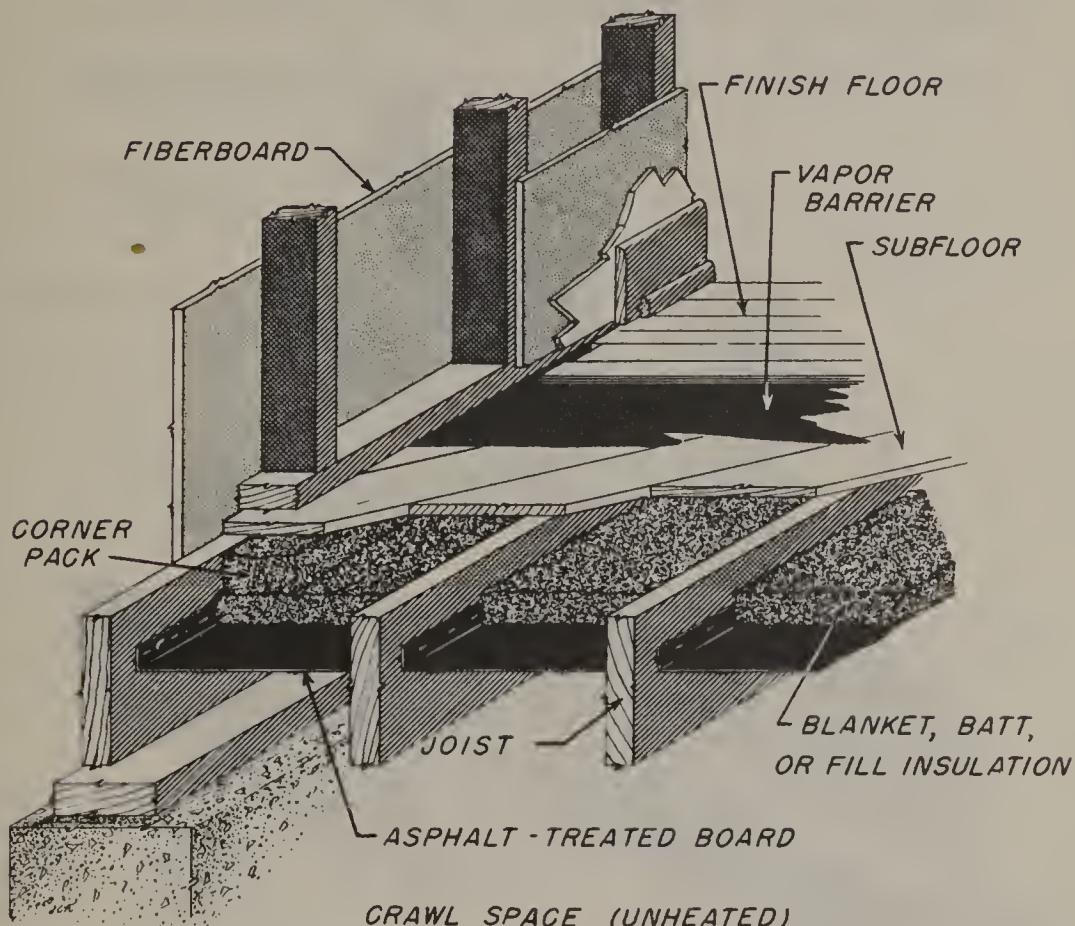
Basementless house, floor detail No. 2.* Condensation control is not an important feature of this detail. Although the asphalt-treated board may be a good vapor barrier it is not practical to seal the joints between sections of the boards and consequently, water vapor may escape from the floor section. As in figure 17, a paper of vapor-barrier quality is recommended between the subfloor and the finish floor to prevent the finish floor from absorbing too much water vapor from a damp crawl space below. An alternate method of supporting blanket, batt, or fill-type thermal insulation which in this detail may be of the type not having an effective vapor barrier, is with an asphalt saturated stiff board, folded to form channels and installed from the top side of the floor. The flanges of the channel must be securely stapled or nailed to the sides of the joists with corrosion-resistant nails or staples spaced not more than 6 inches center to center. The board may be fastened to the lower edge of the joists if there is sufficient working space below the floor. Corner packs of insulation to provide warmer floors near the outside of the building should be placed along the outside joists or headers to build the insulation up to the underside of the subfloor. It may be either fill- or batt-type insulation.
